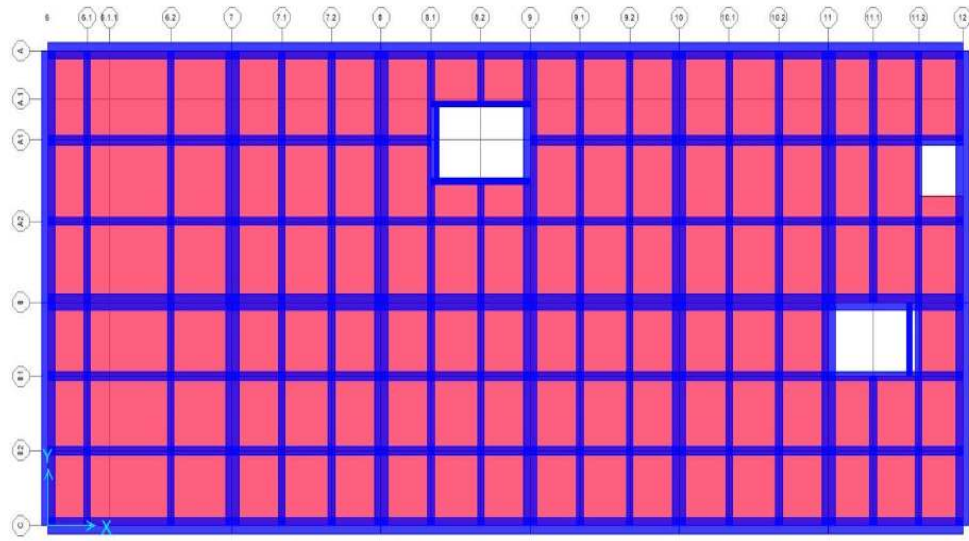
First floor plan view of the structure in the XY plane(SAP2000 Floor Plan Image, prepared within the scope of this thesis study.).
